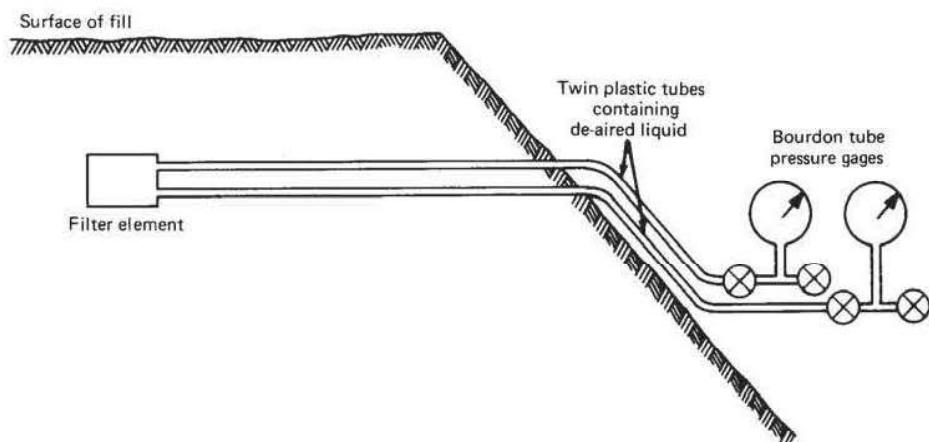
Schematic of twin-tube hydraulic piezometer installed in fill.
